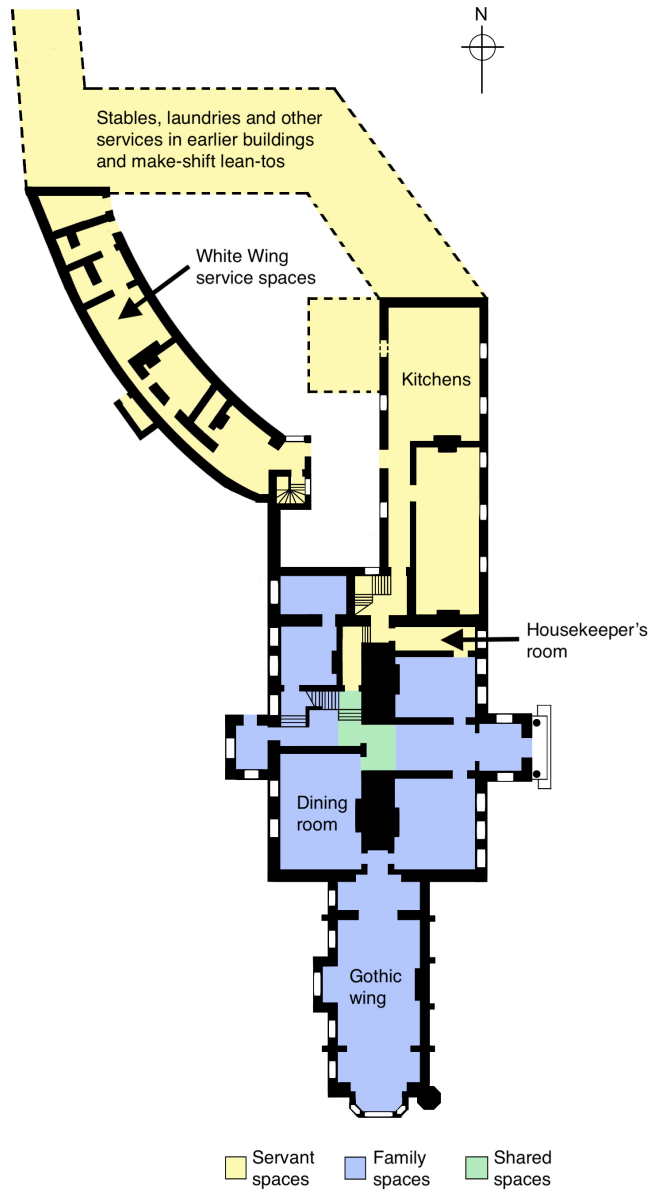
Kiplin Hall c1820 Phase 2 ground floor plan
